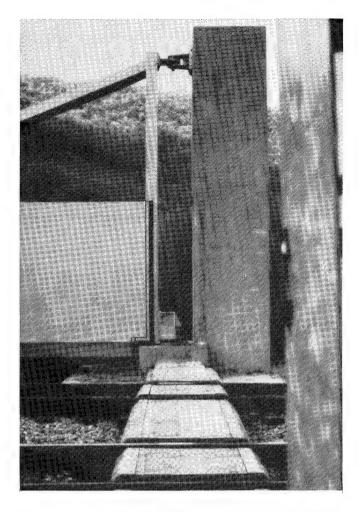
Completed closure structure, Pineville Levee and Floodwall
